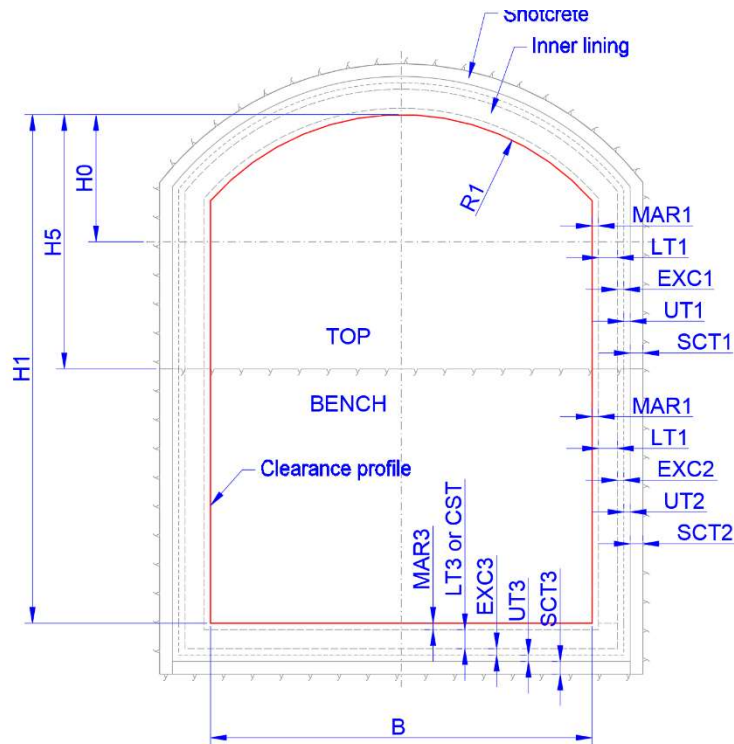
Cross section Type 1, phase 1 and 2 excavation (EXPH=3)
